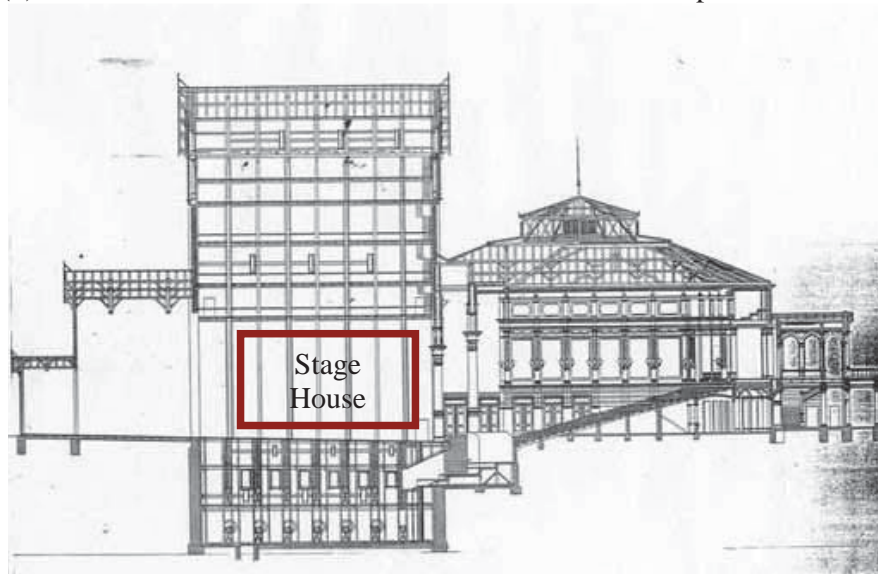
FESTSPIELHAUS LATERAL SECTION BY (SACHS, 1898)
